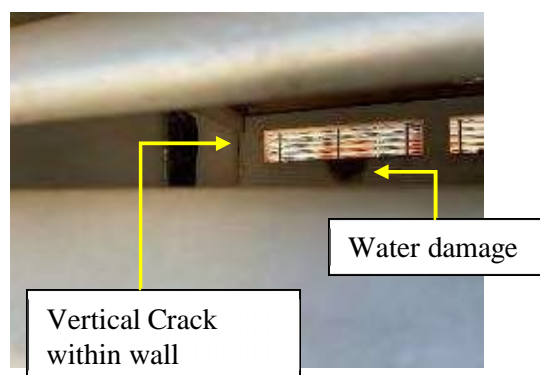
Showing water damage and structural cracking to the internal walls in the transformer room
